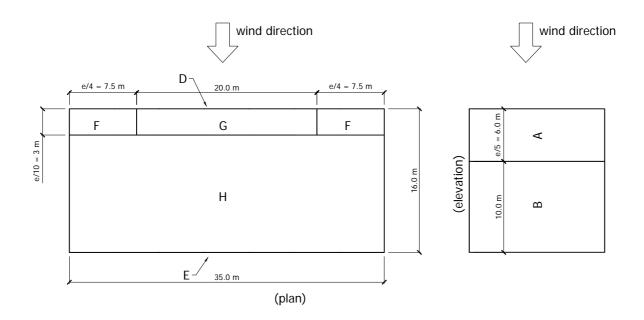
Wind direction orthogonal to the wall with greatest surface area.
